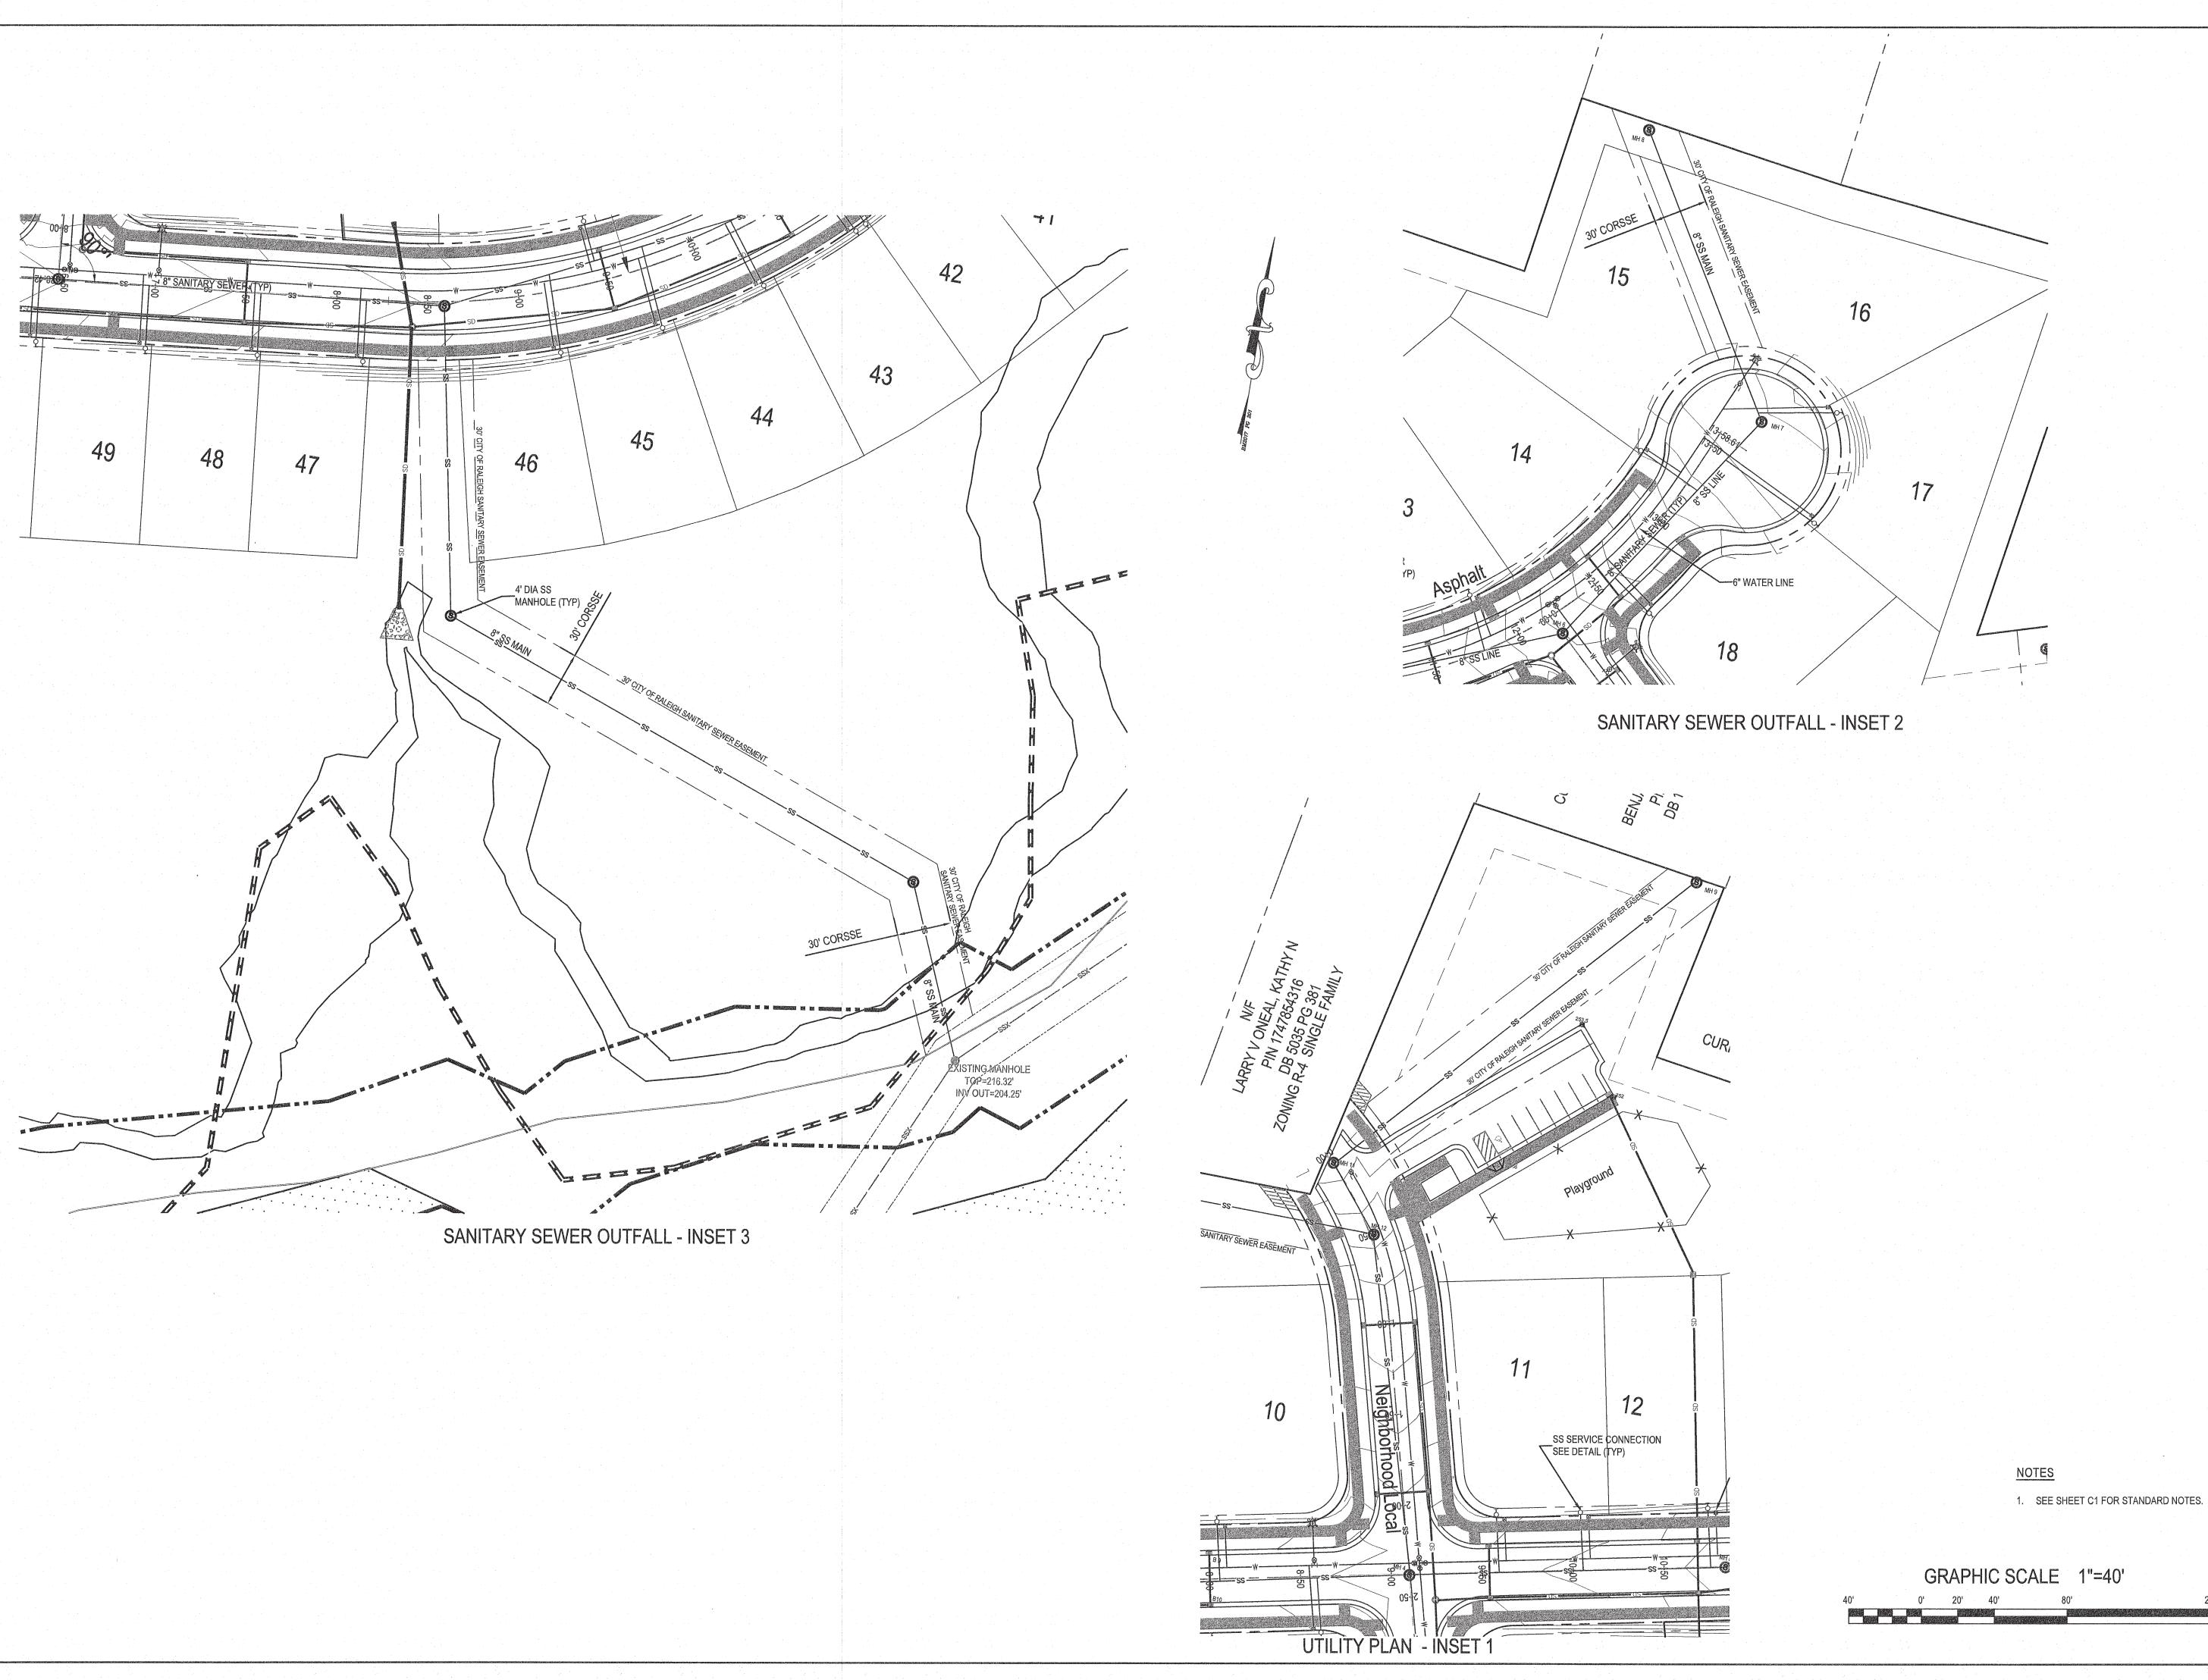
Sketch Plan review (11-#-551543) Transaction # 592980 S-19-19
